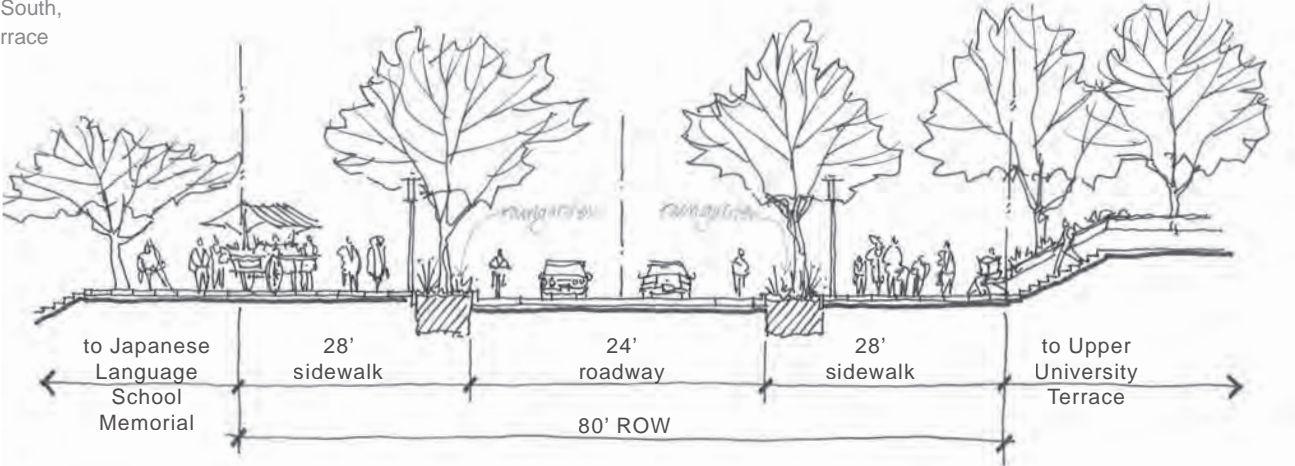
| Street Section C - Market Street Looking South at University Terrace
